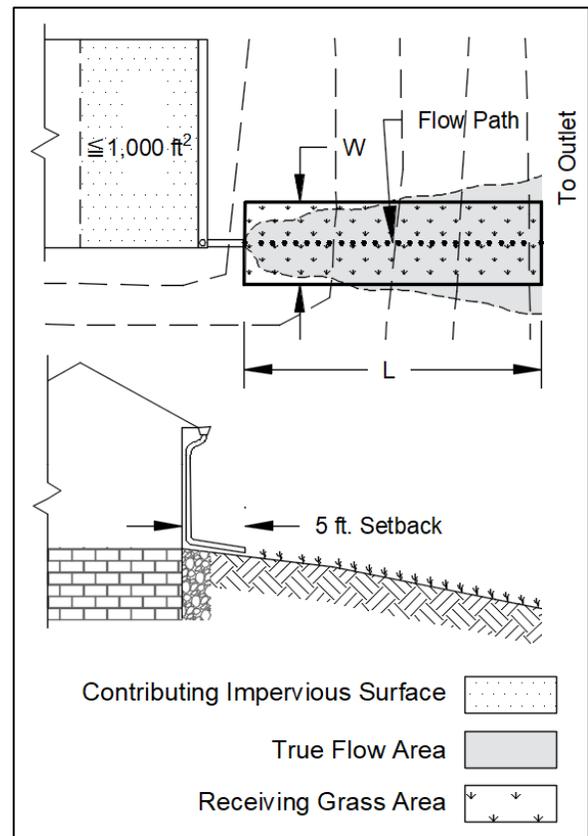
Illustration of a Roof Downspout Disconnection to a Receiving Grass Area (not to scale)
